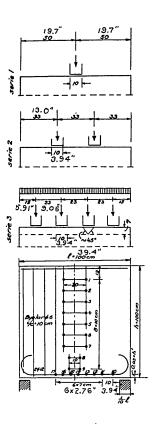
Loading Condition and Beam Dimensions in Klingroth's Test
